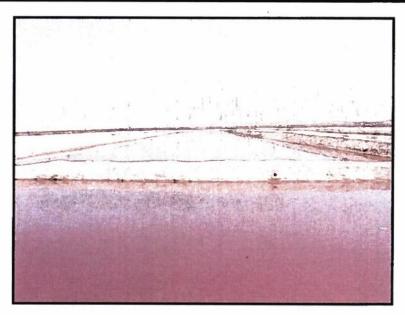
View of third to last impoundment (No. 23) looking southeasterly.
